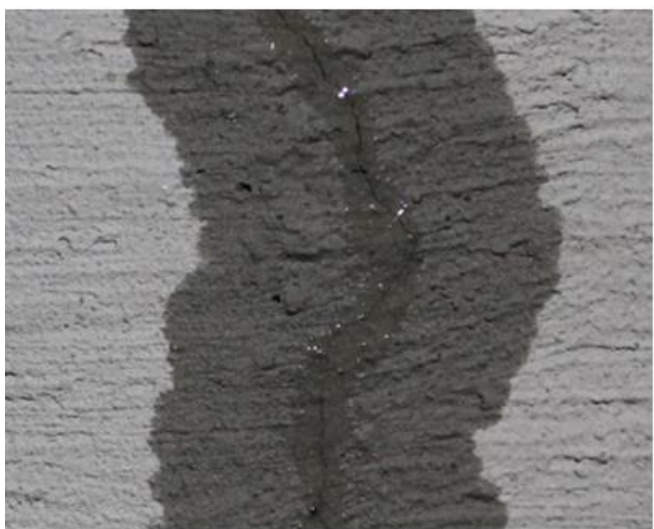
Gradual dampening of the insulation coating where the crack appeared.
